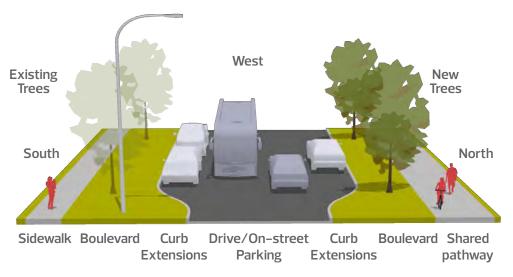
161 Avenue – 121 Street to 127 Street – Cross section
